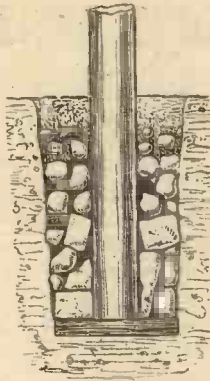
When erecting tall pergolas in rustic woodwork the base of each post should be sunk in the ground to a depth of at least 1ft. 6in. and well rammed round with earth and stones.
